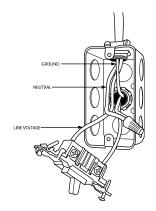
Field-Supplied Electrical Box on Furnace Casing
